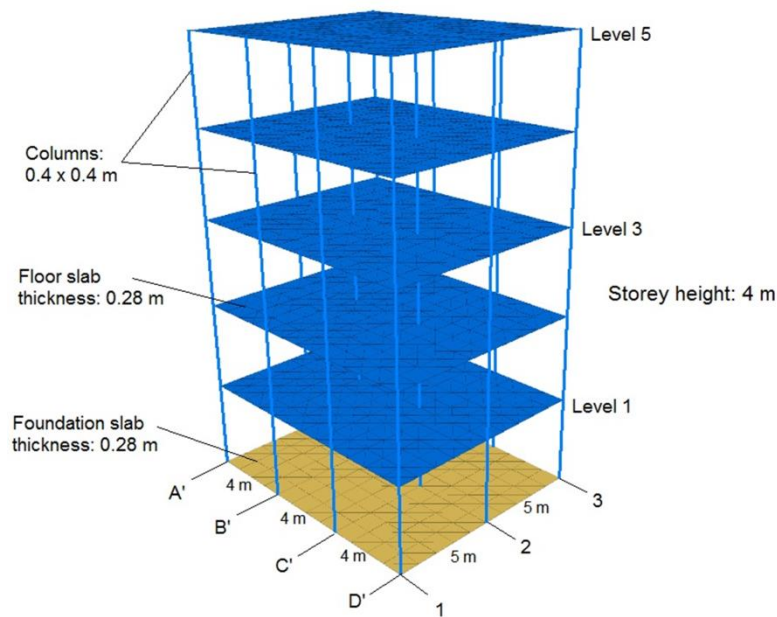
Columns and slabs sections in the 5-storey concrete frame building
